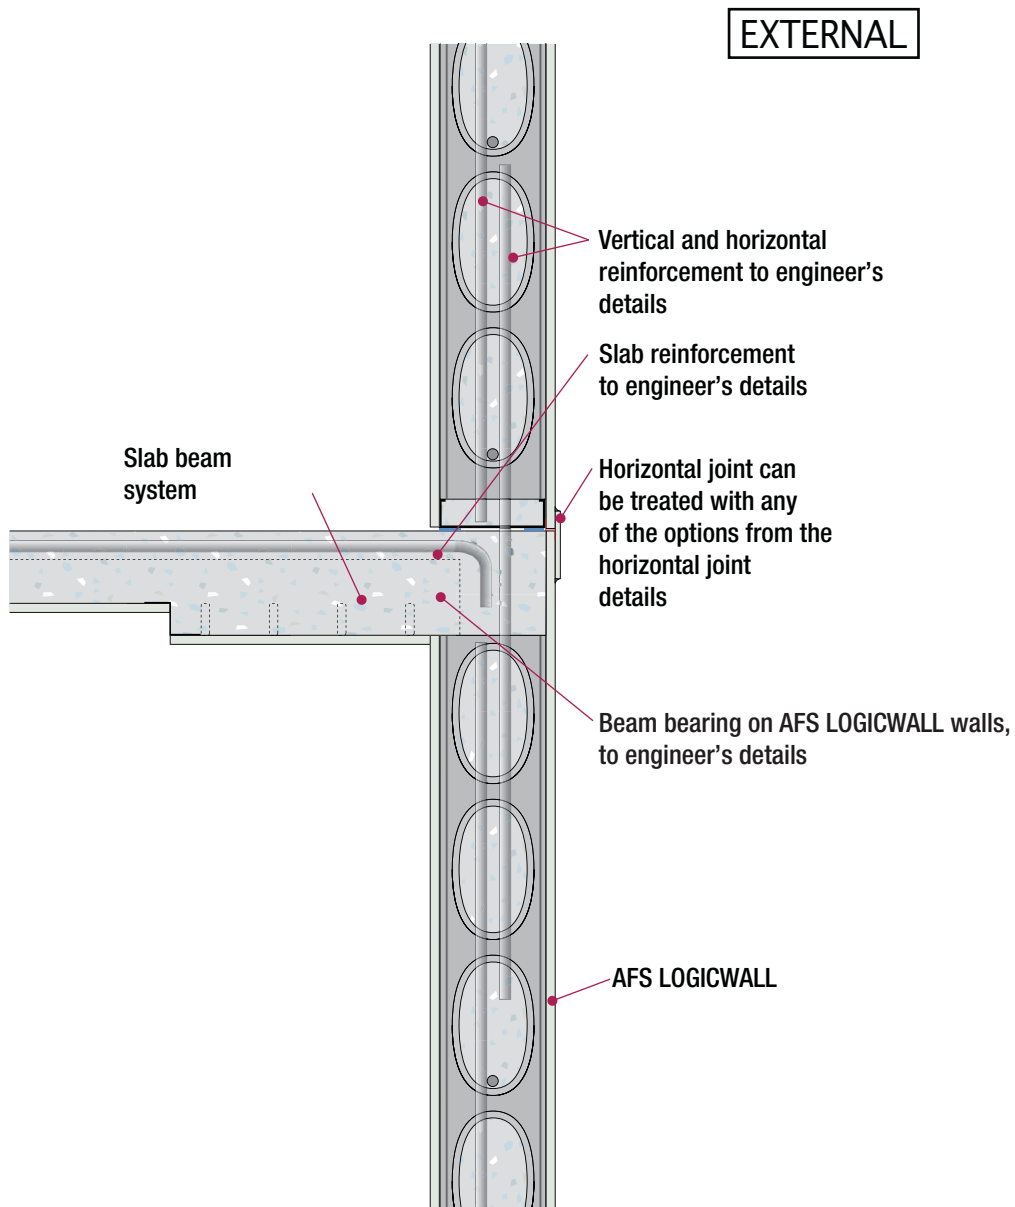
Wall Slab Junction, Beam System Perpendicular to AFS Logicwall® Façade Wall
